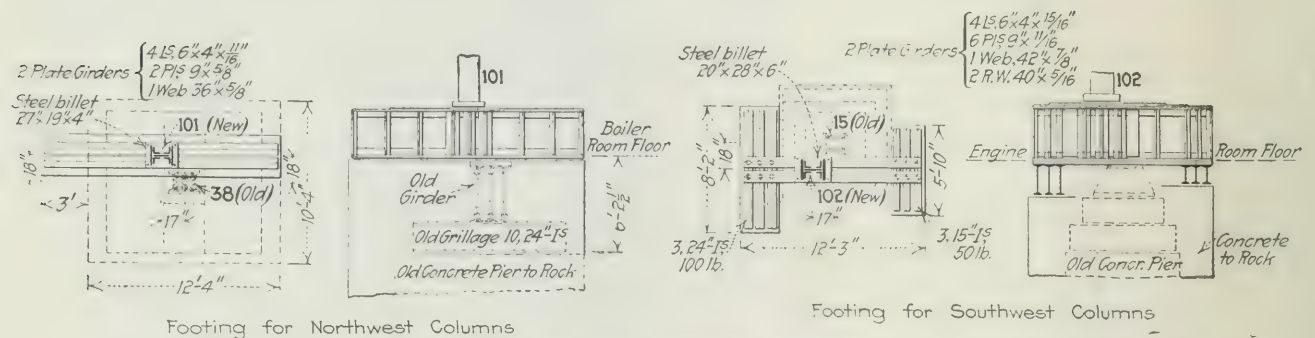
FOOTINGS OF TWO OF THE NEW COLUMNS, SHOWING METHOD OF ENLARGING OLD FOOTINGS
